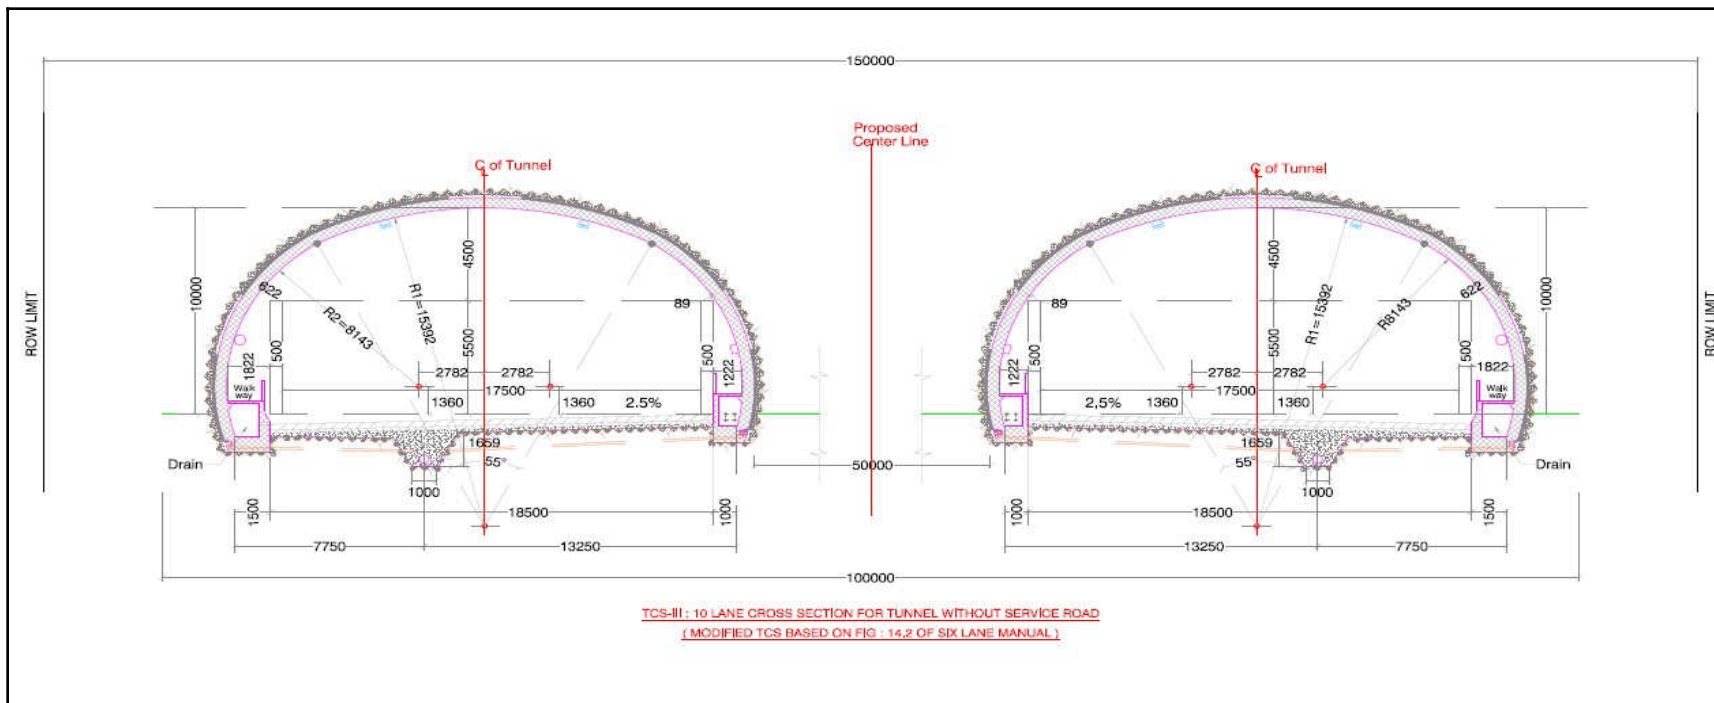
LANE CROSS SECTION FOR TUNNEL WITHOUT SERVICE ROAD (FUTURE 10 LANES)
